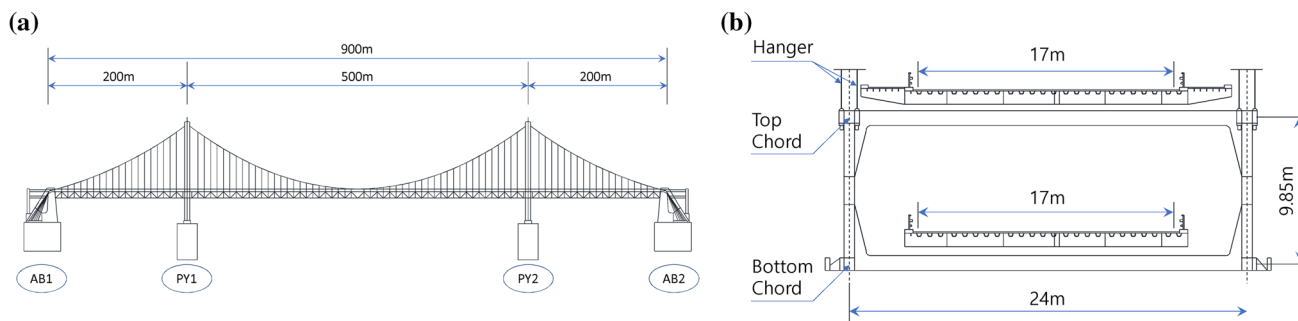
Gwangsan Bridge overview. a Span length. b Cross-section of the stiffening truss
